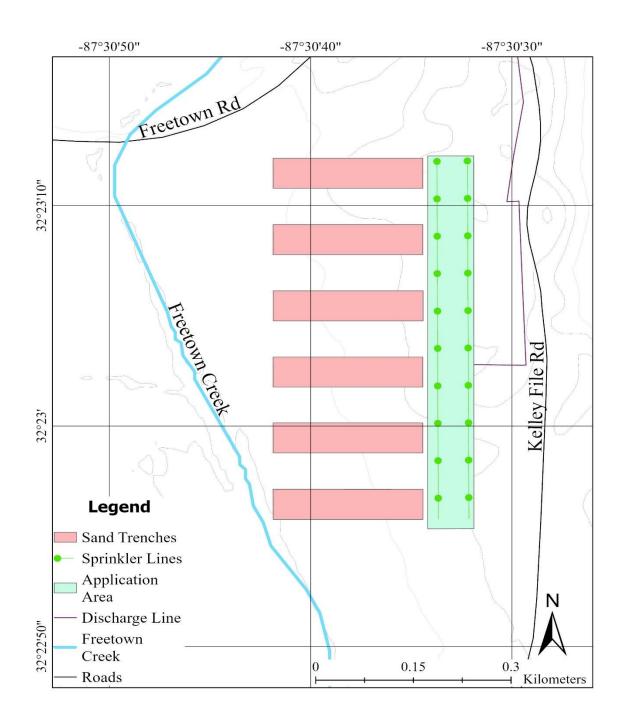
Conceptual Sand Trench Design with Existing Sprinklers
